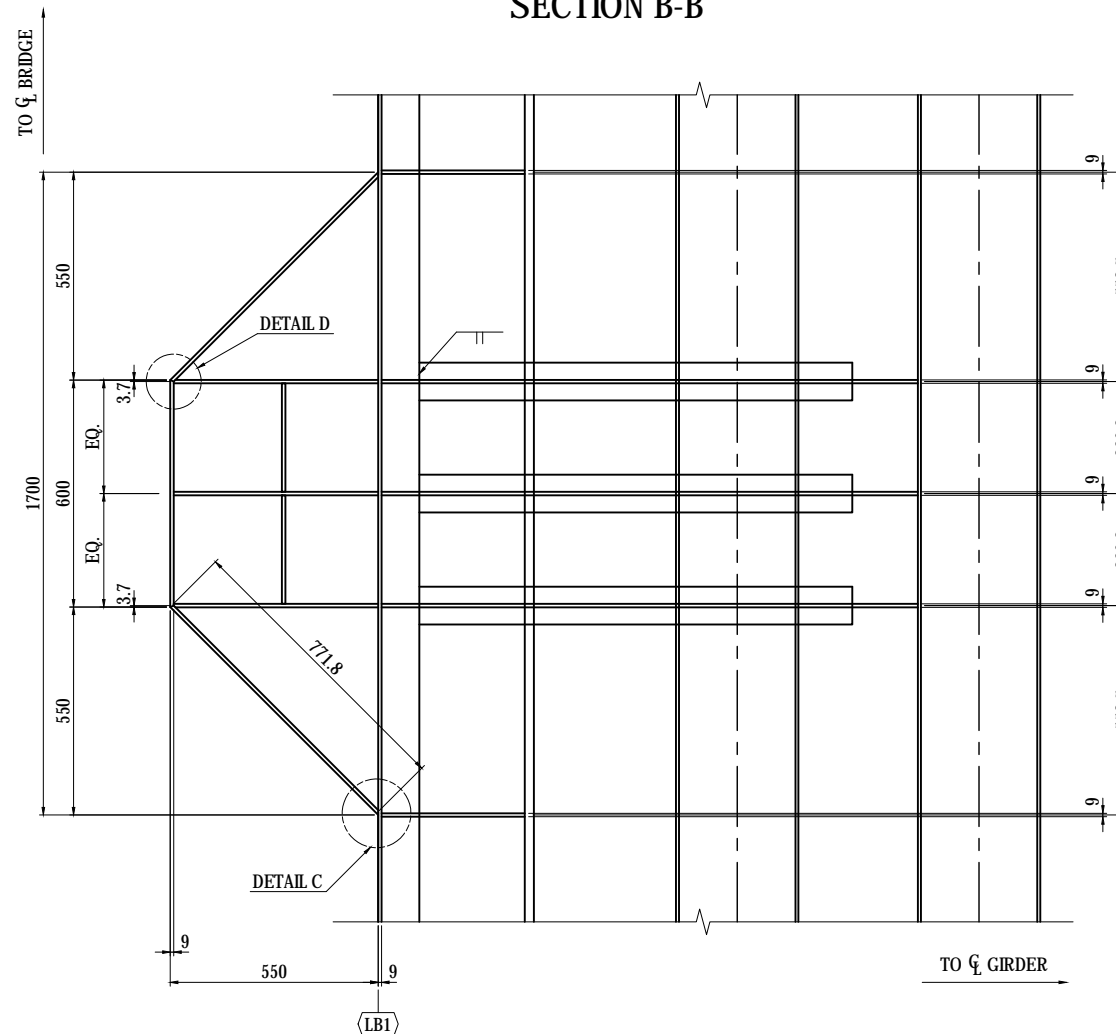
# DETAIL OF MAIN GIRDER STANDARD (13) S=1:20
